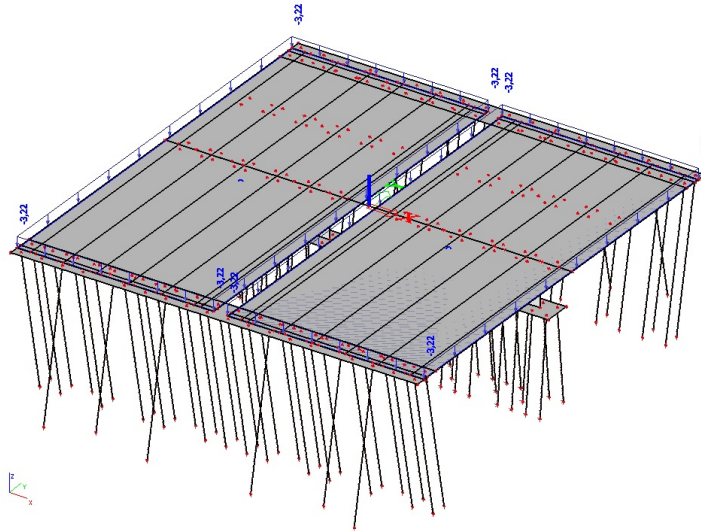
Imposed load from asphalt on the concrete deck in SCIA
